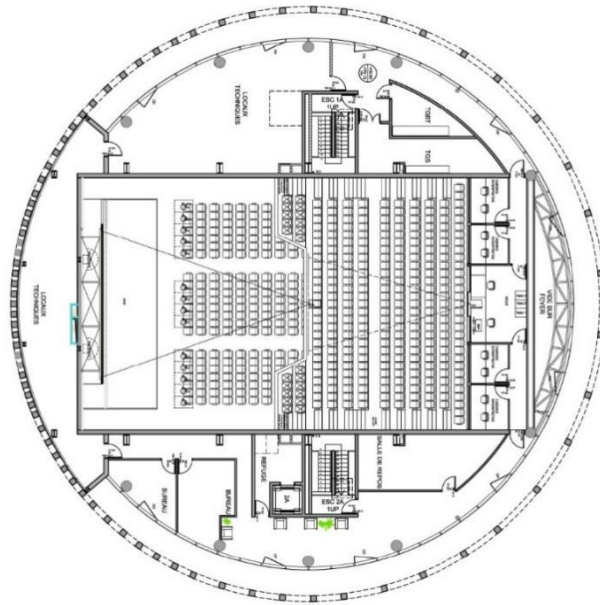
Floor plan layout of Maroc Telecom Office Building
